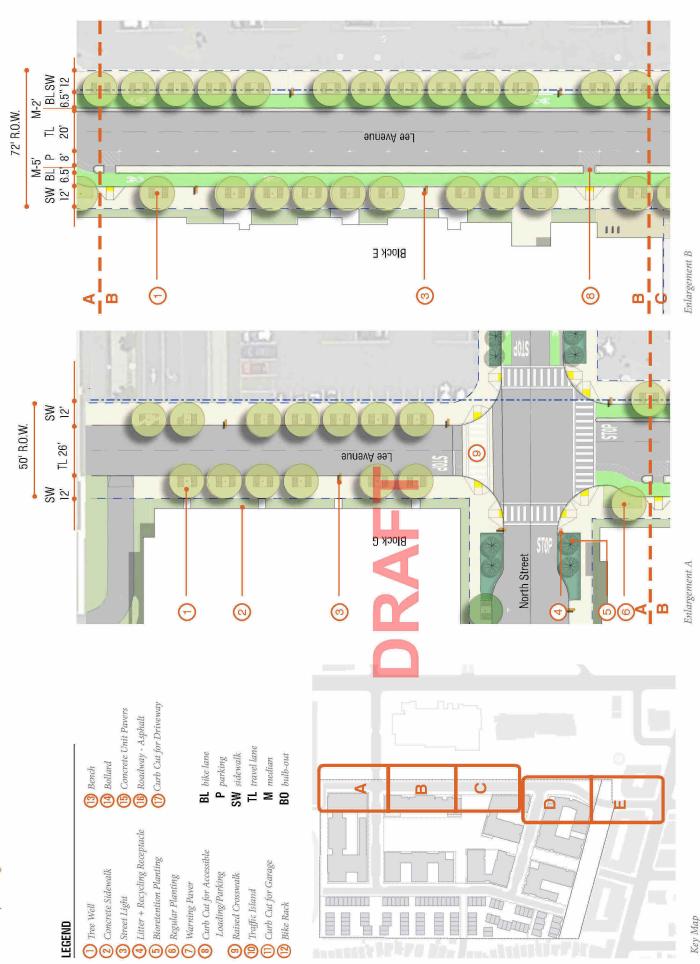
2: Lee Avenue, Plan Enlargements
